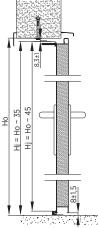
Installation of a single-leaf door with a wrap-around frame to a masonry wall – vertical cross-section
